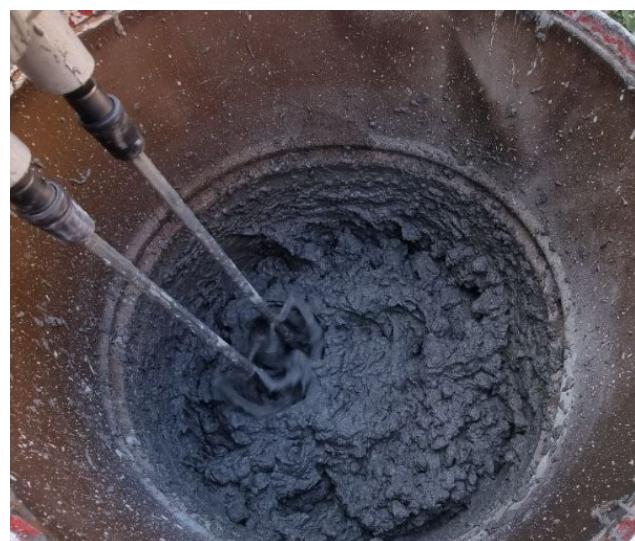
Mixing concrete with an electrically driven laboratory mixer.
